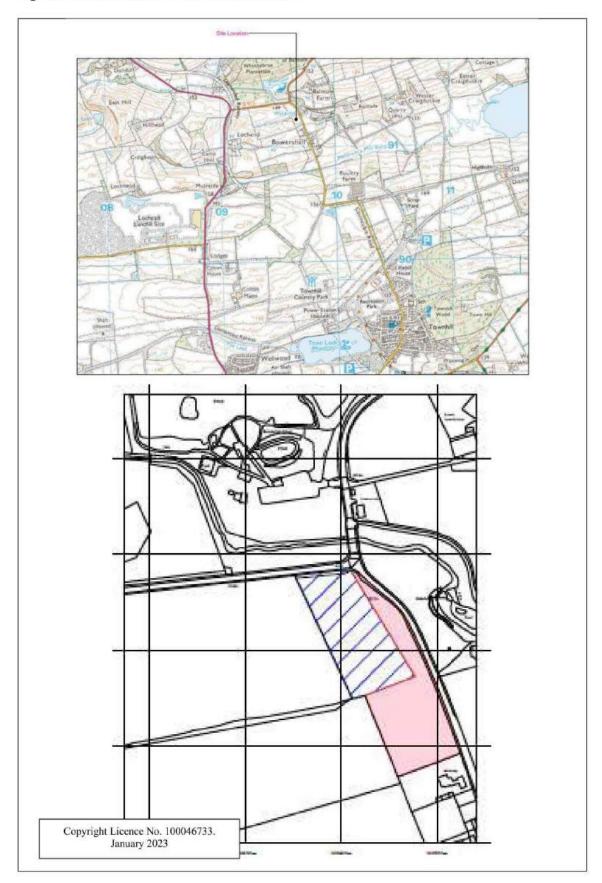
PROPOSED SITE LAYOUT & TEST LOCATION PLAN
